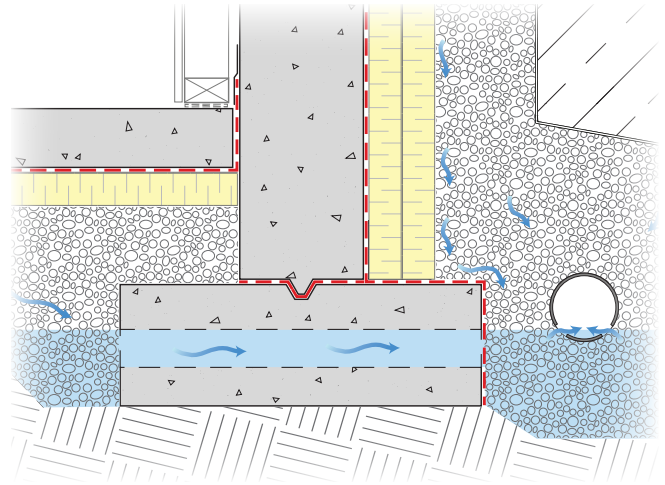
"Best practice" foundation, with capillary break between the footing and foundation wall (requires two pours and the removal of formwork cleats) and positioning of the drain pipe below the top of the footing.
